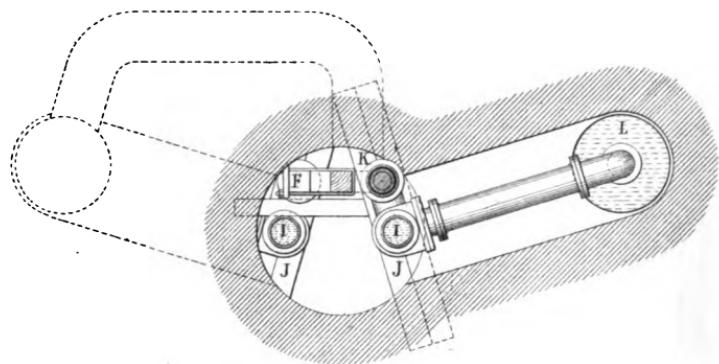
Sectional Plan of Pit at Lower Plunger Pump.
